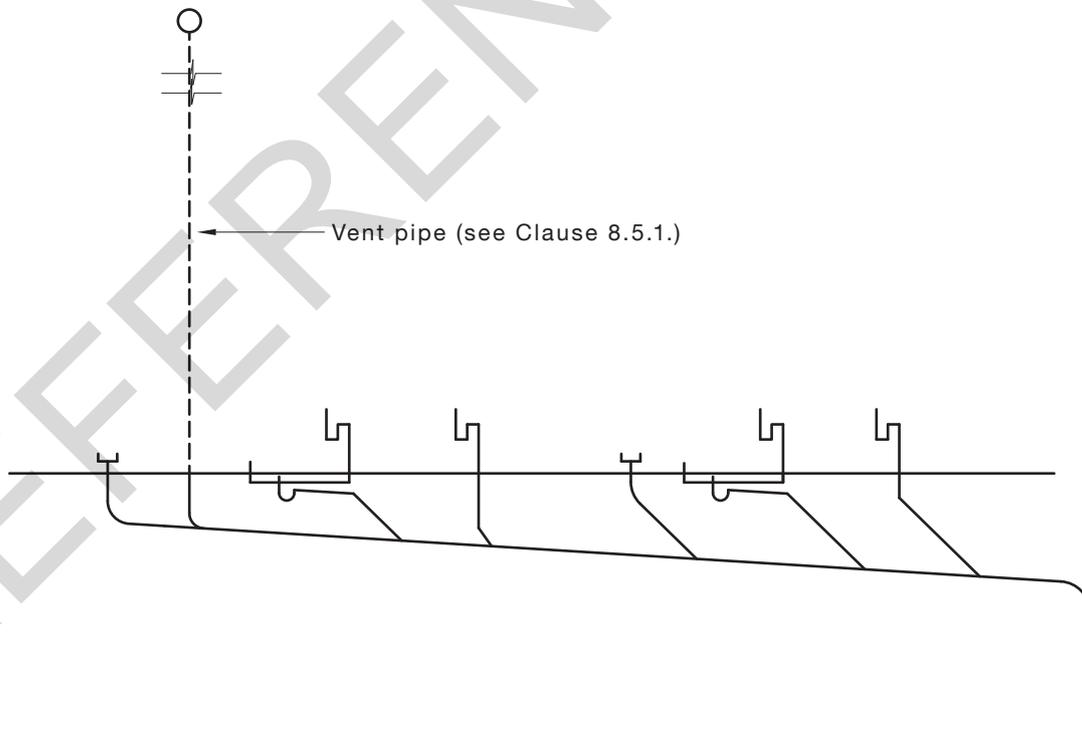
VENT CONNECTED TO GRADED PIPES
